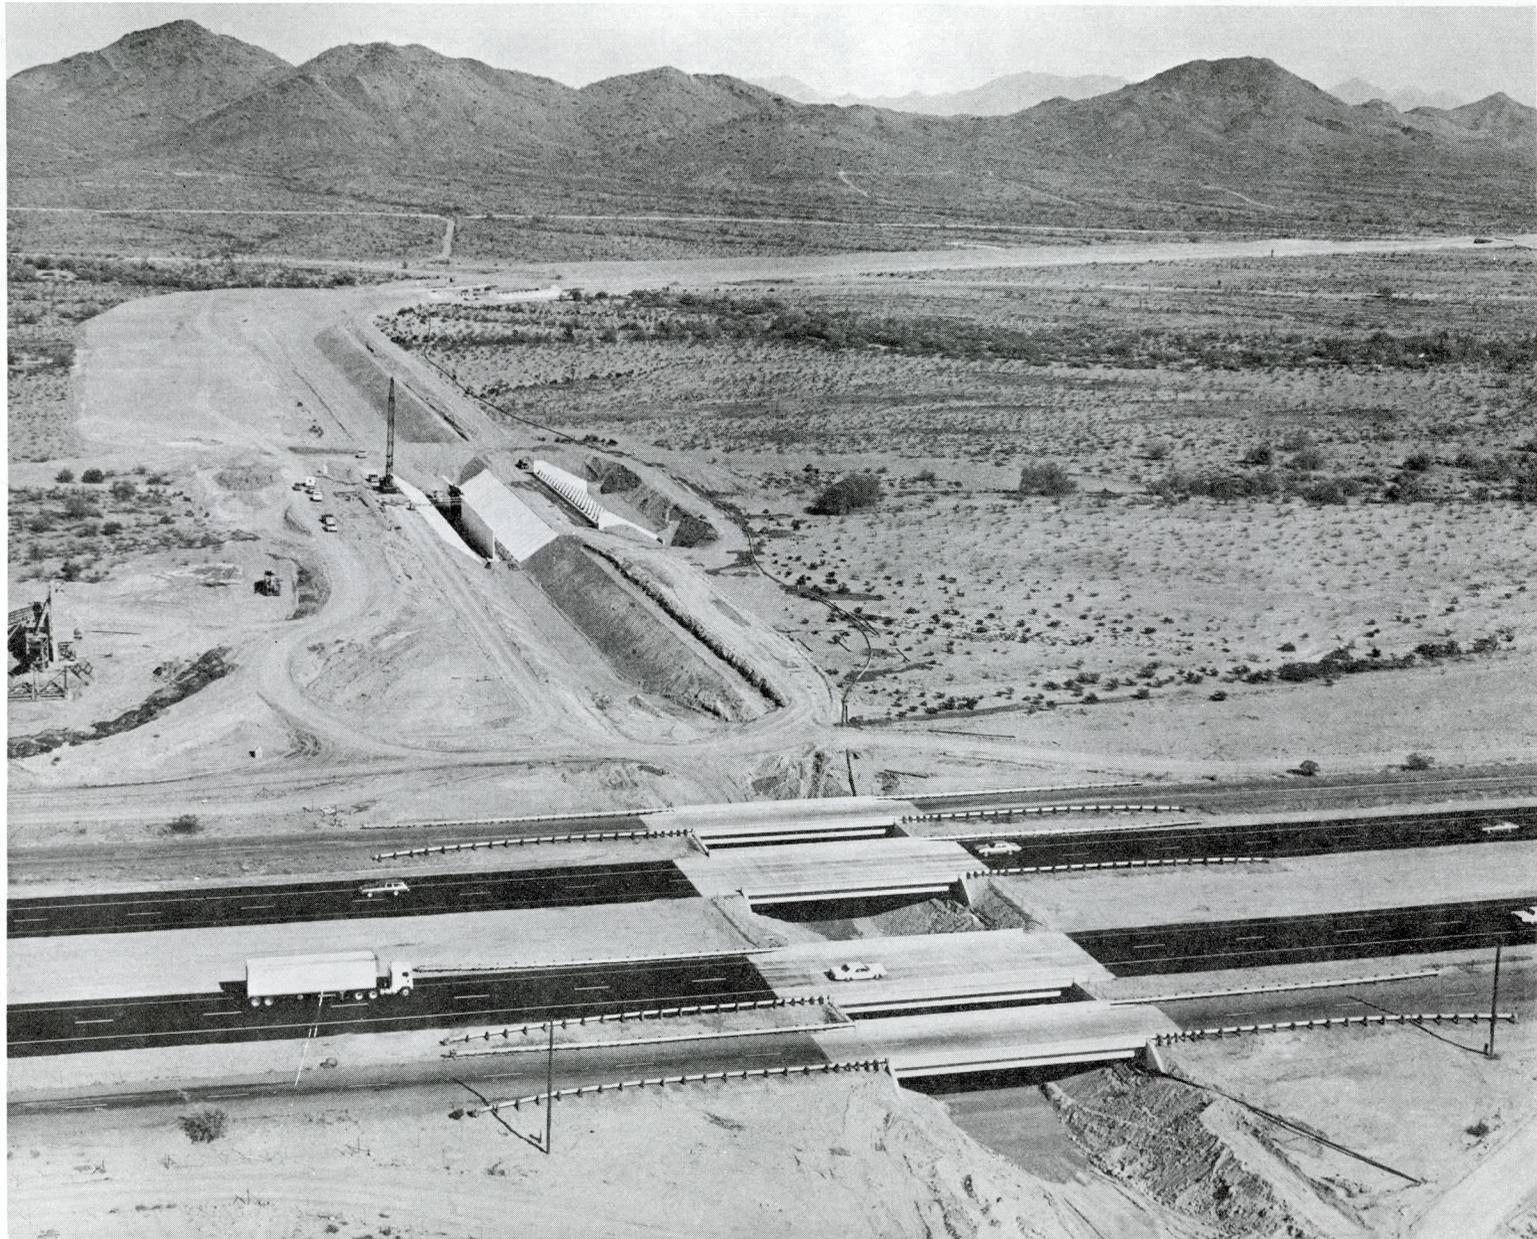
Typical State Highway Bridge--Granite Reef Aqueduct--Central Arizona Project. Aerial view showing the interstate highway bridges on I-17 north of Phoenix, Arizona. A similar type bridge would be used at State highway crossings. Photograph No. P344-300-02327 NA (0).
